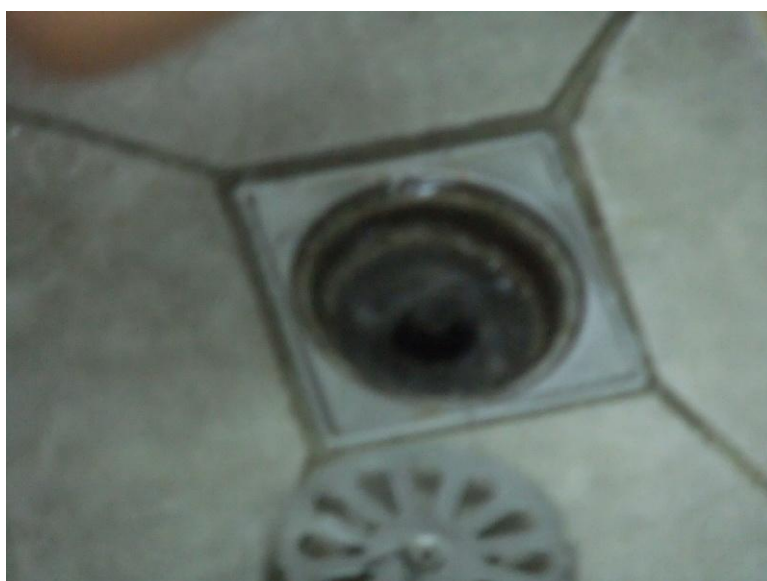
Housekeeper Throwing Hair and Waste into the Drain Pipe
